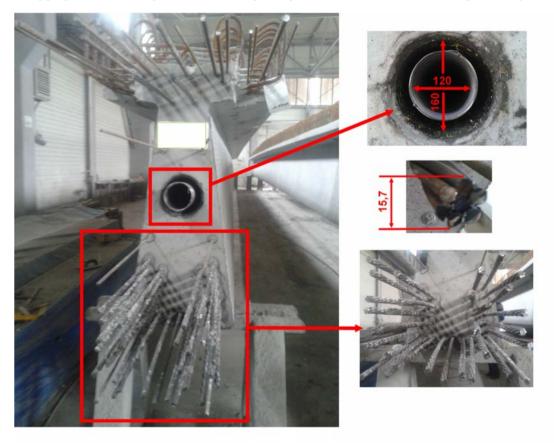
Pre-post-tensioned beam manufactured at a precast concrete plant.
